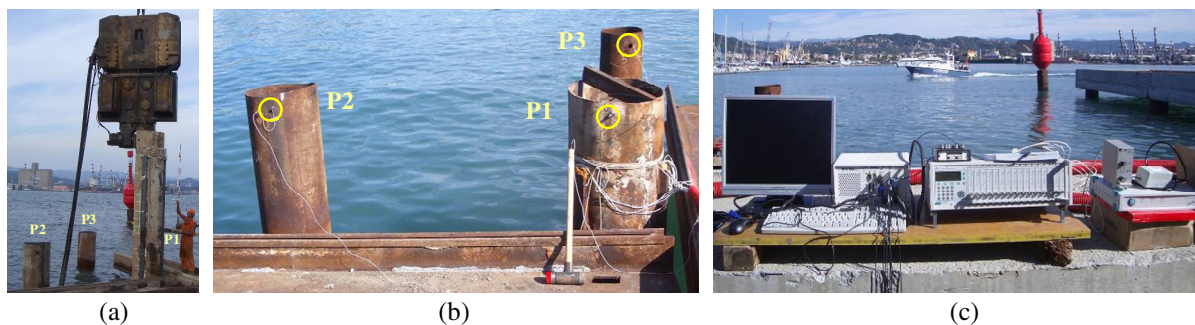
(a) Test field; (b) pile layout, accelerometers and instrumented hammer; (c) measuring chain
